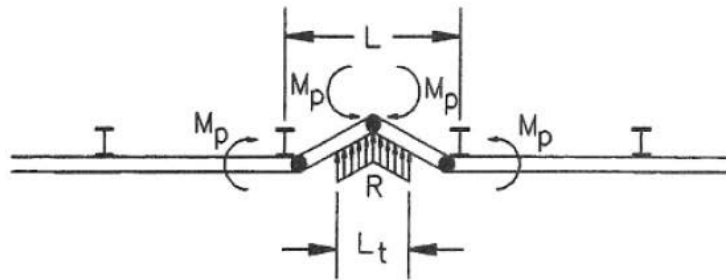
Single-Span Failure Mode for Post-and-Beam Railings
